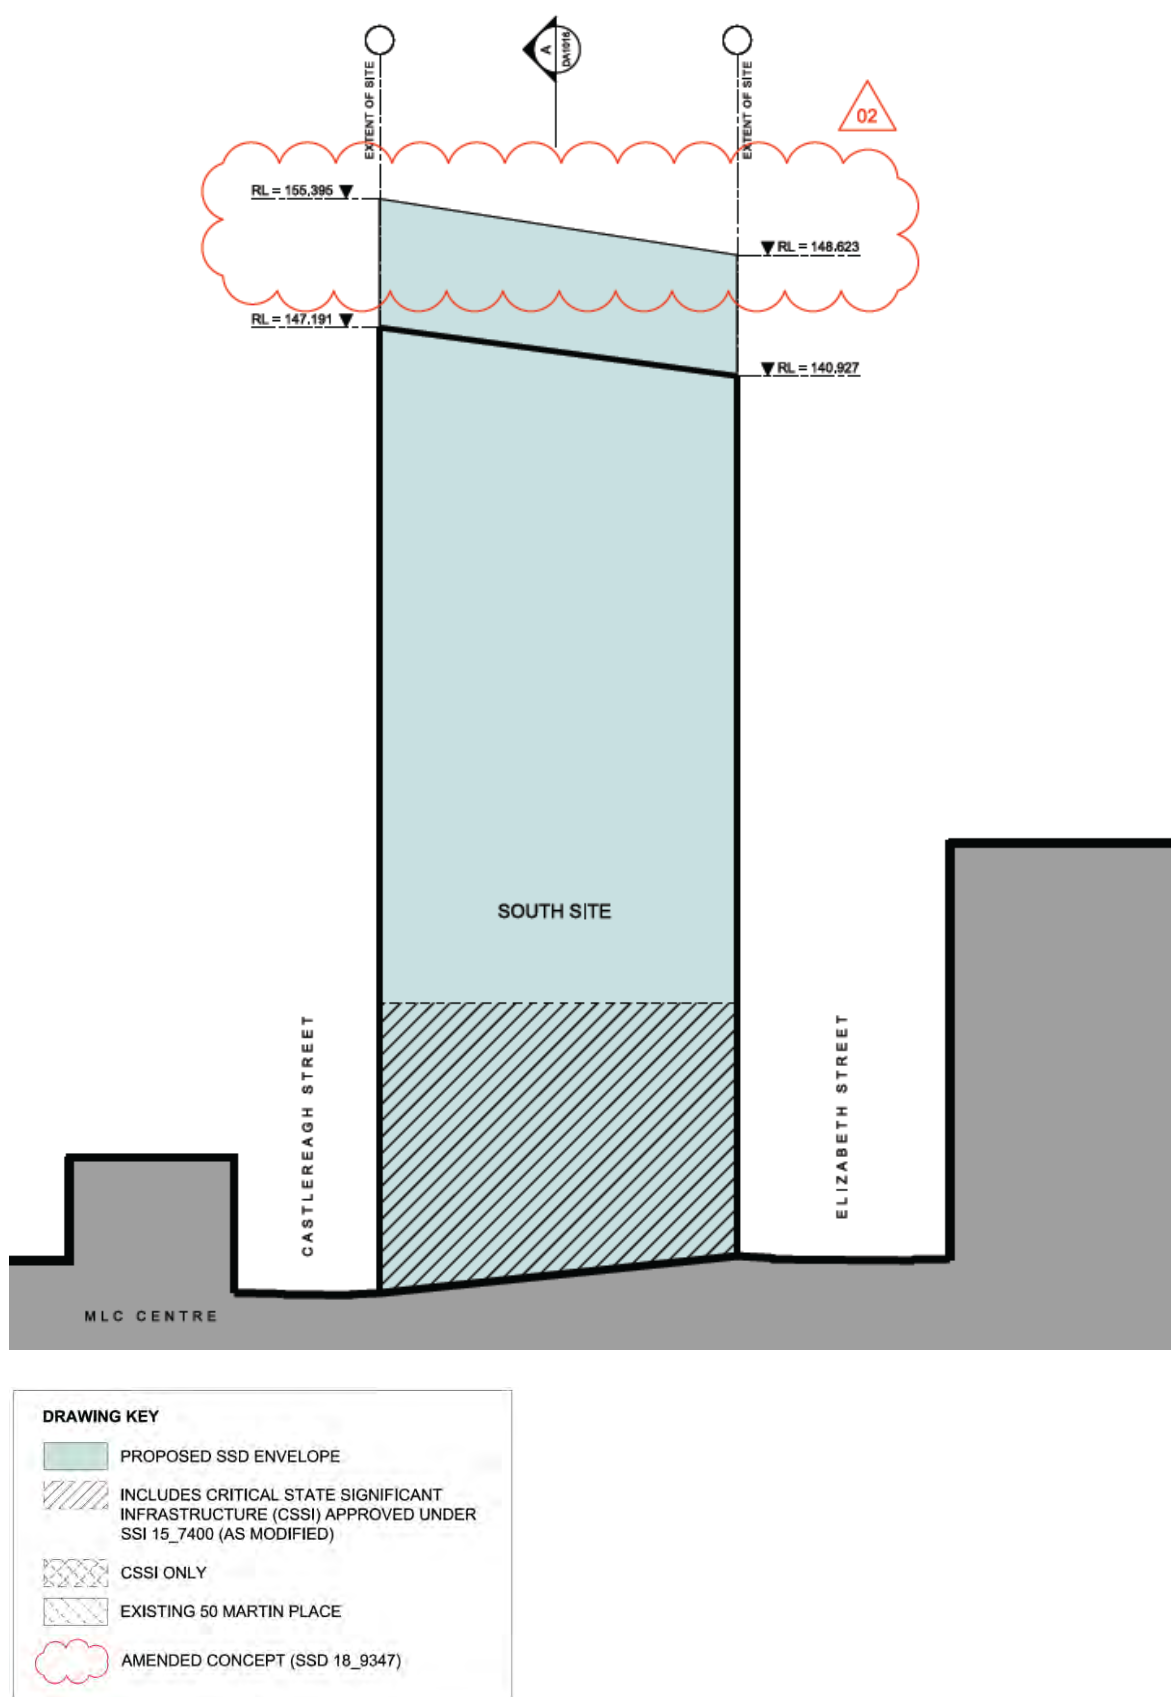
Proposed South OSD tower building envelope, south elevation (amendment clouded red)
